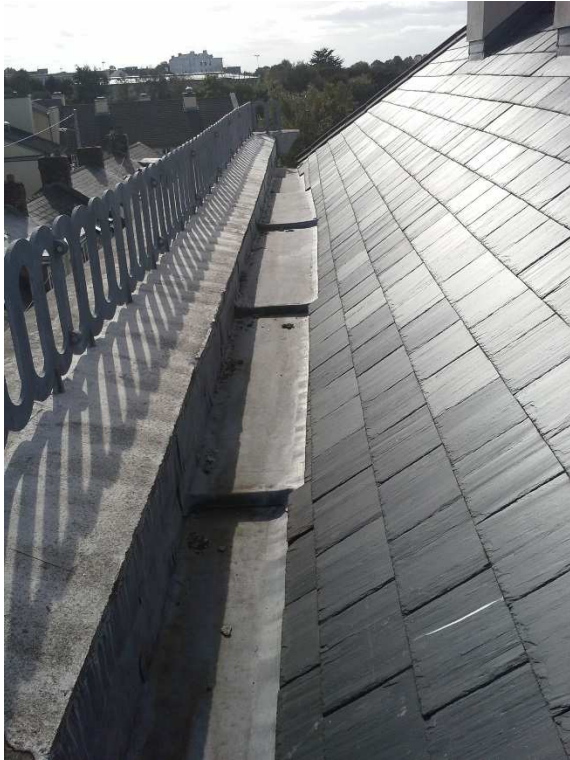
Photos showing new lead gutters stepped down from centre point to outlets into new cast aluminium downpipes.
